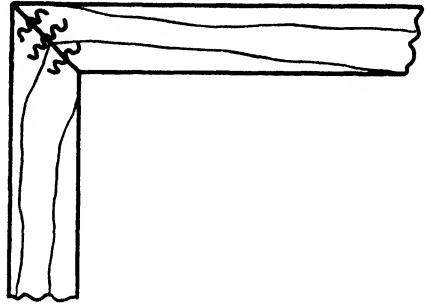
Corrugated fasteners used to strengthen a miter joint.
